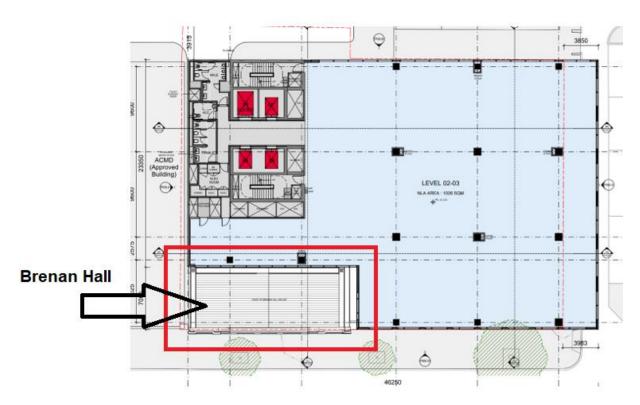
Level 02 – 03 floor plan showing 7m setback now adopted to Level 03 (consistent with that at Level 02) from Brenan Hall retained façade in the south-west corner.
